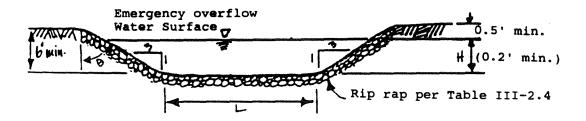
Weir Section for Emergency Overflow Spillway
